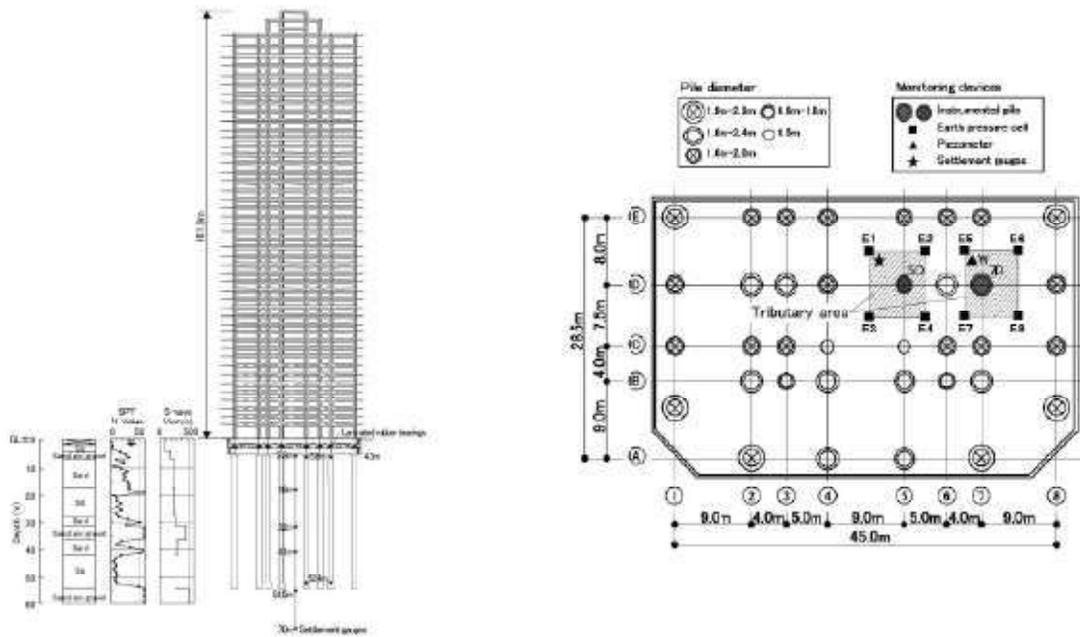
The soil profile and the foundation plan of 47 story residential tower (after Yamashita et al., 2010)
